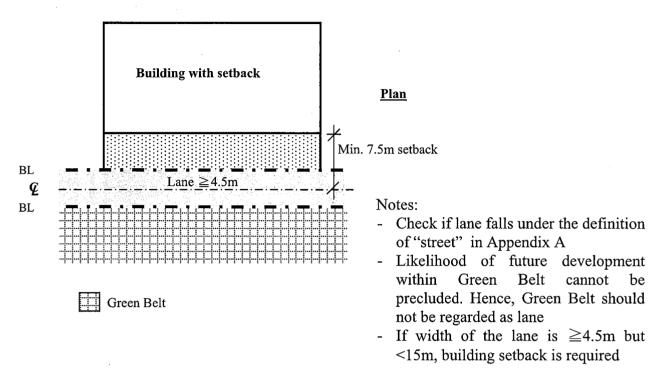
Example (1) of Building Setback - Site abutting narrow lane with Green Belt beyond
